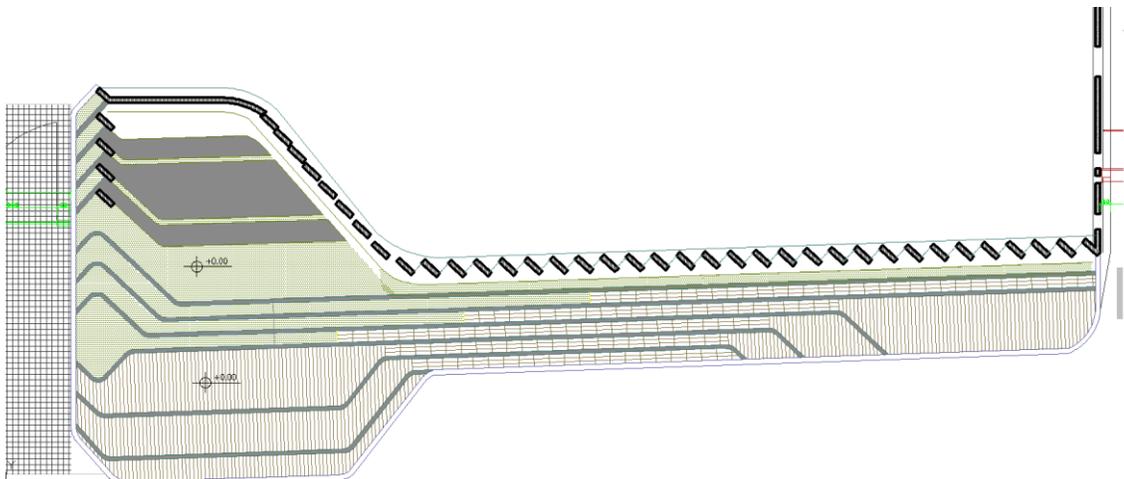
The right part of the wall in plan [AutoCAD, 2016].
